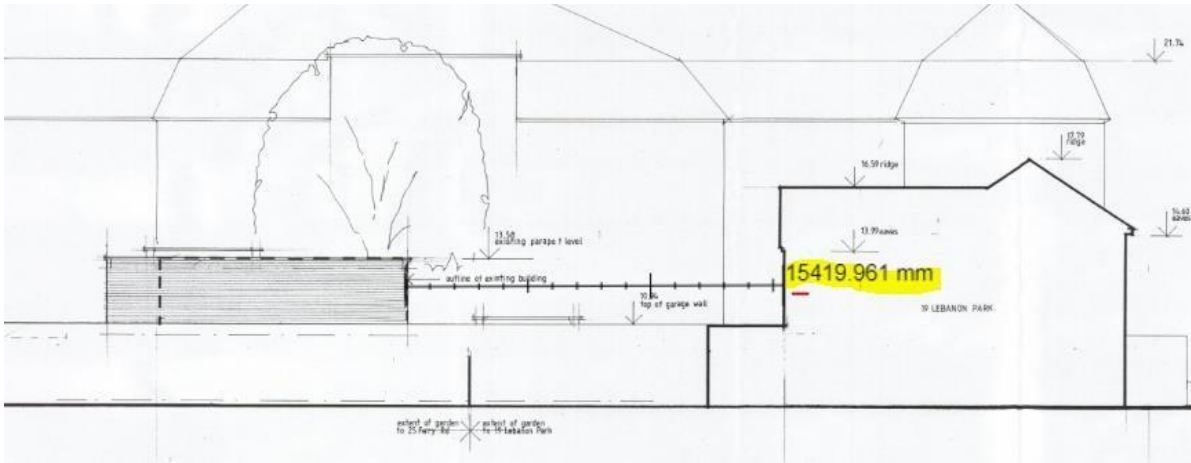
Proposed rear elevation (Approved under 13/1352/FUL)
